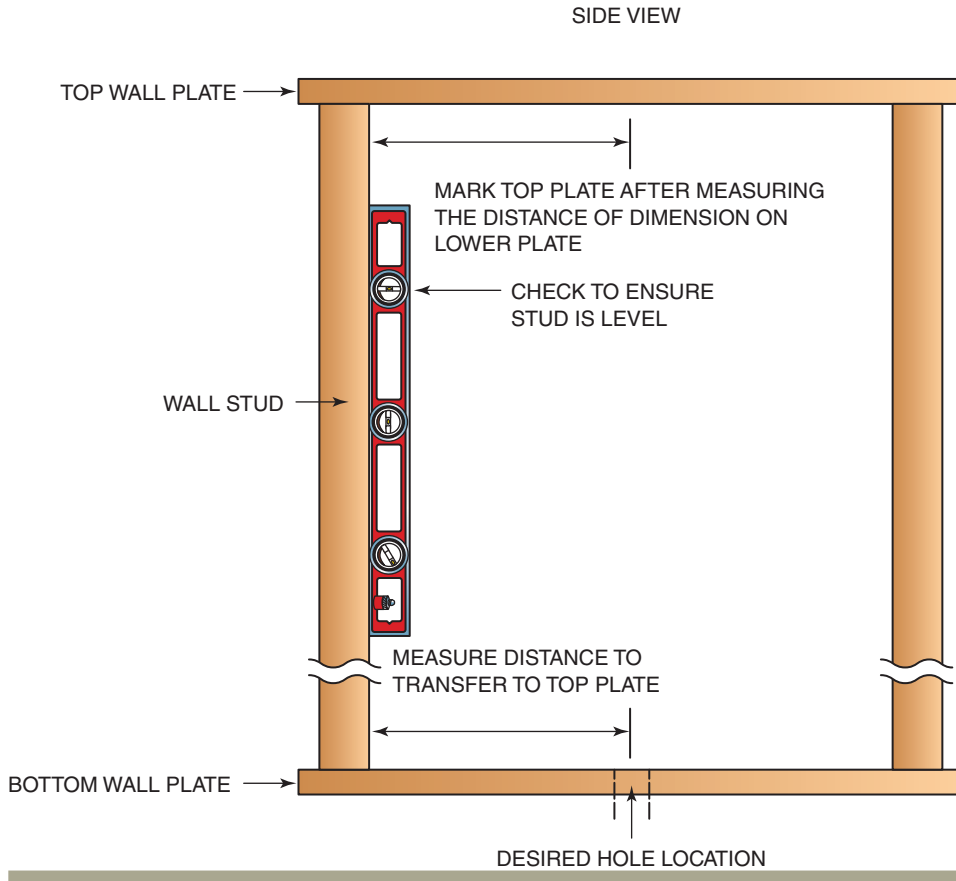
A hole layout for a pipe installed vertically in a wall can usually be performed with only a tape measure.
